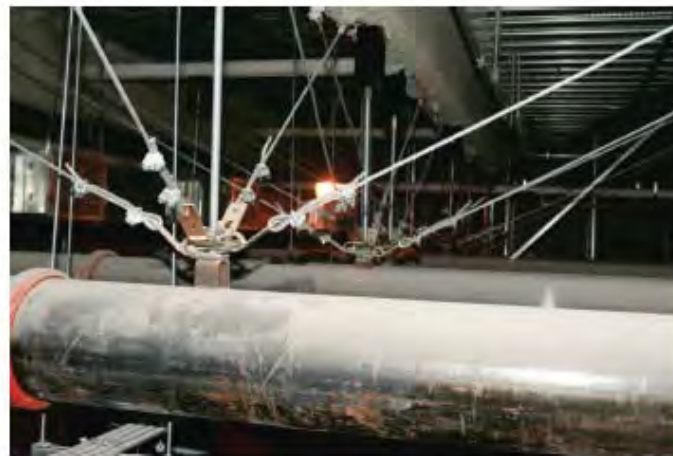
All-directional cable bracing of suspended piping (Photo courtesy of ISAT).
